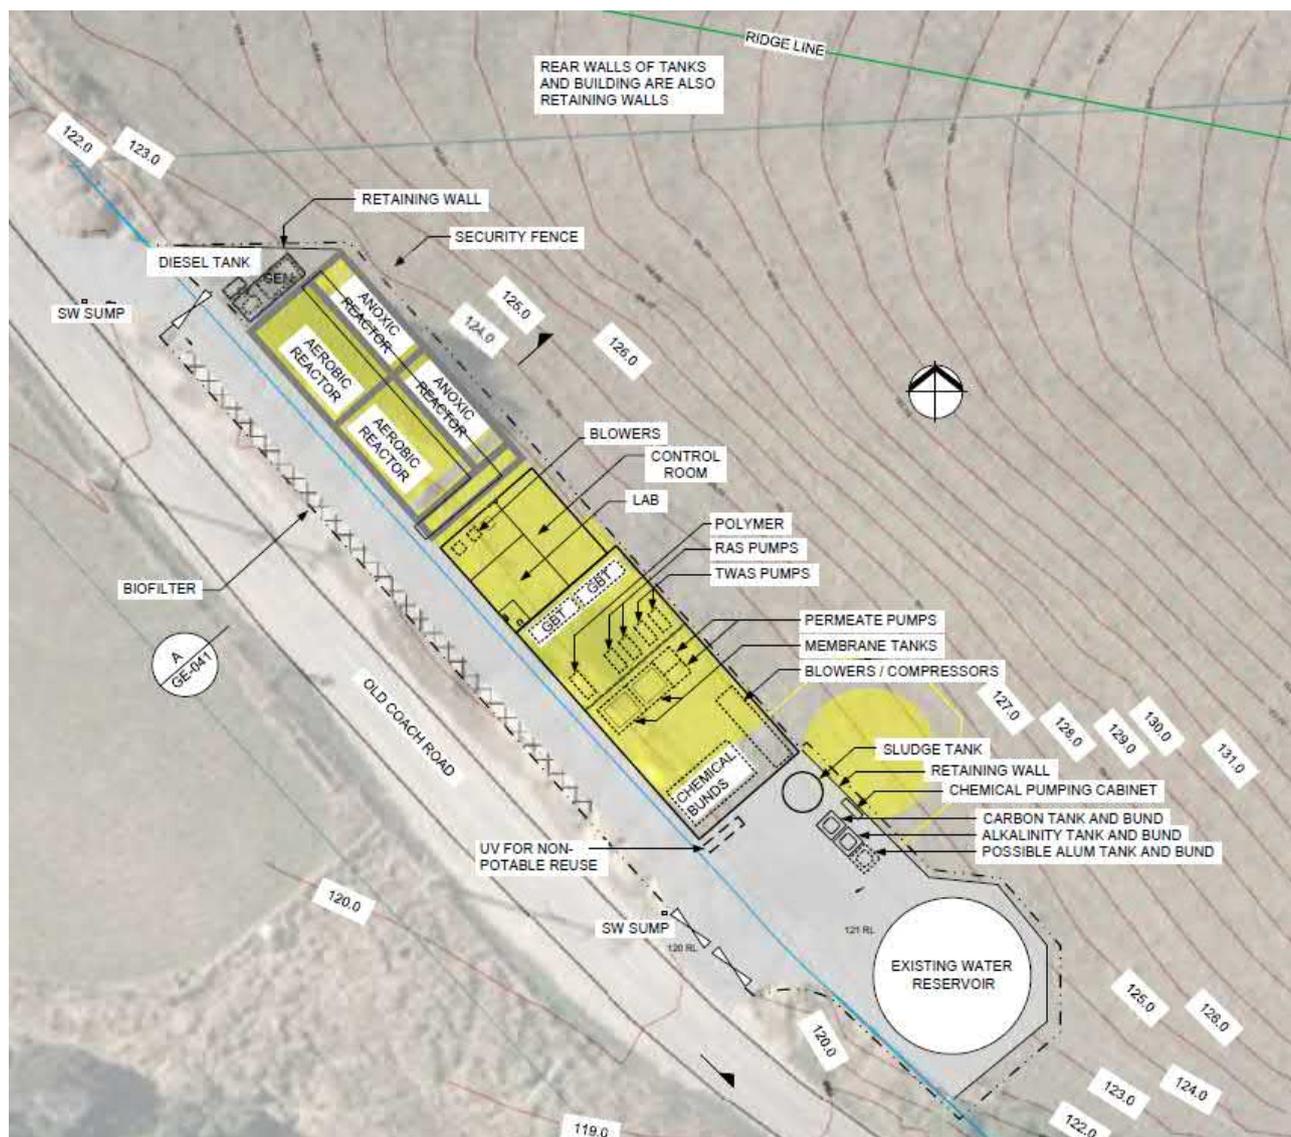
Concept treatment plant layout (previous concept in yellow, RWW storage pond not shown)
